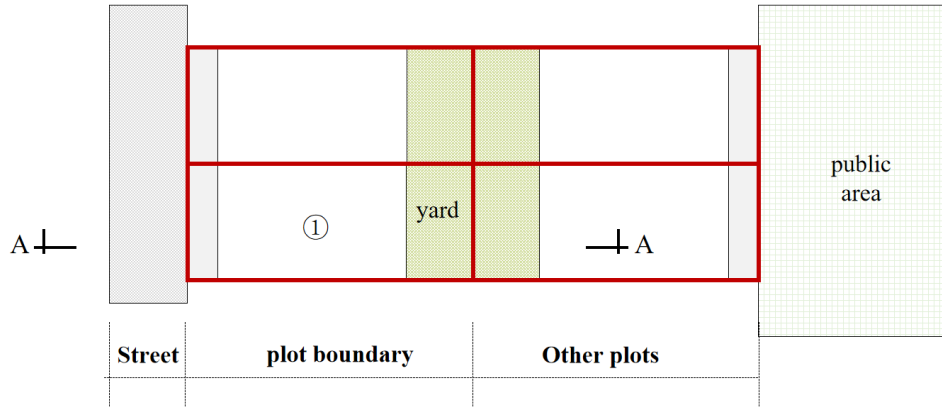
Plan diagram of Area 1 (Source: by the author)
